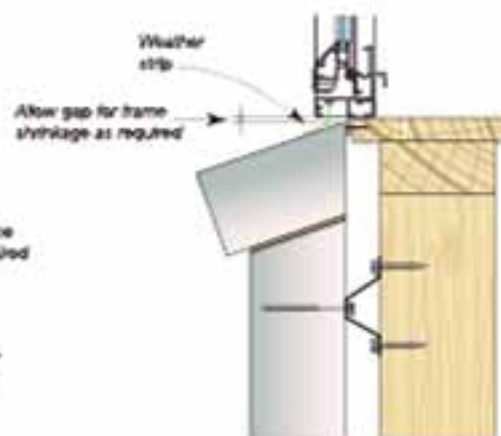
Typical Window Sill Detail - Aluminium Window Frame
